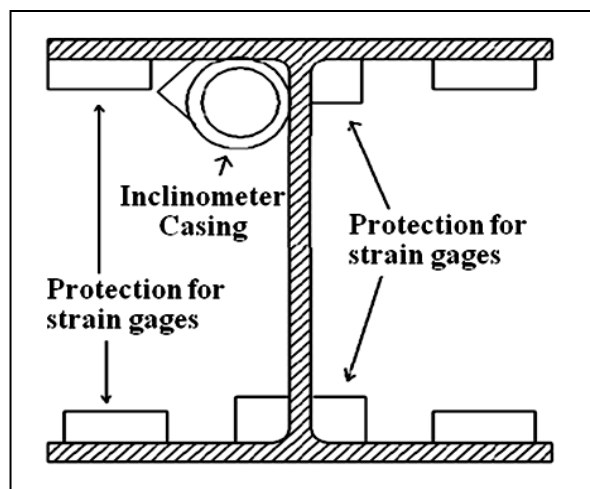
Strain gage and inclinometer layout on piles [31].
